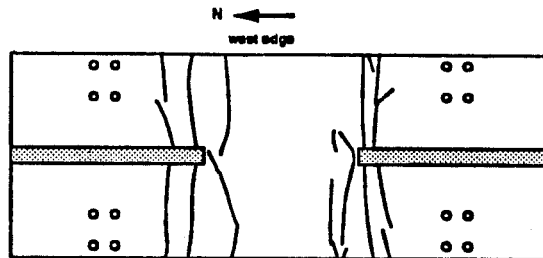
Sp. 2a: Progression of Cracking of Bottom Face of Second Floor Slab at Load Point 284
